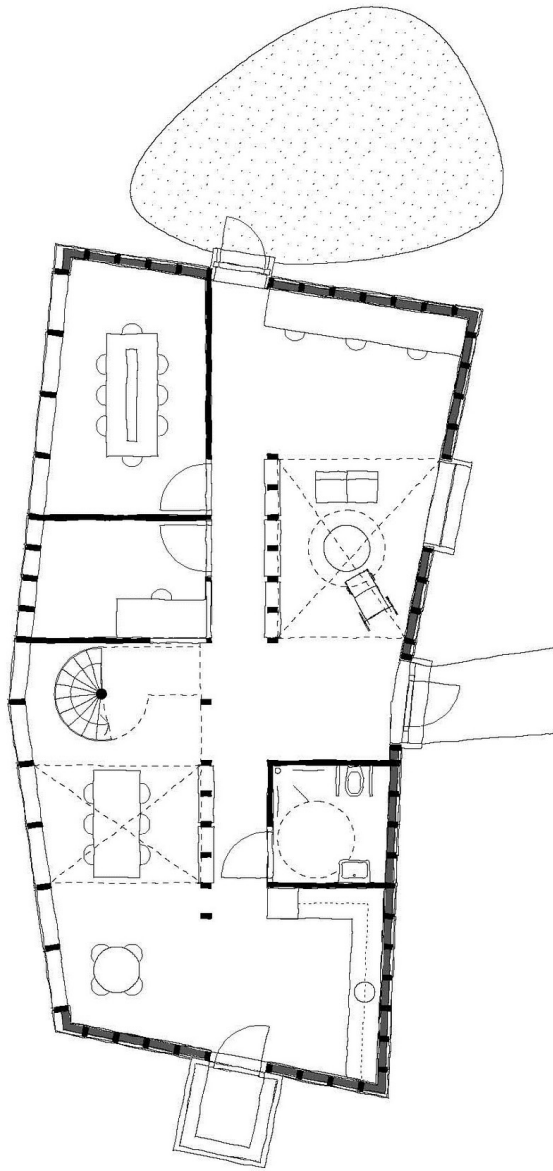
Ground floor [Archdaily, n.d.]
